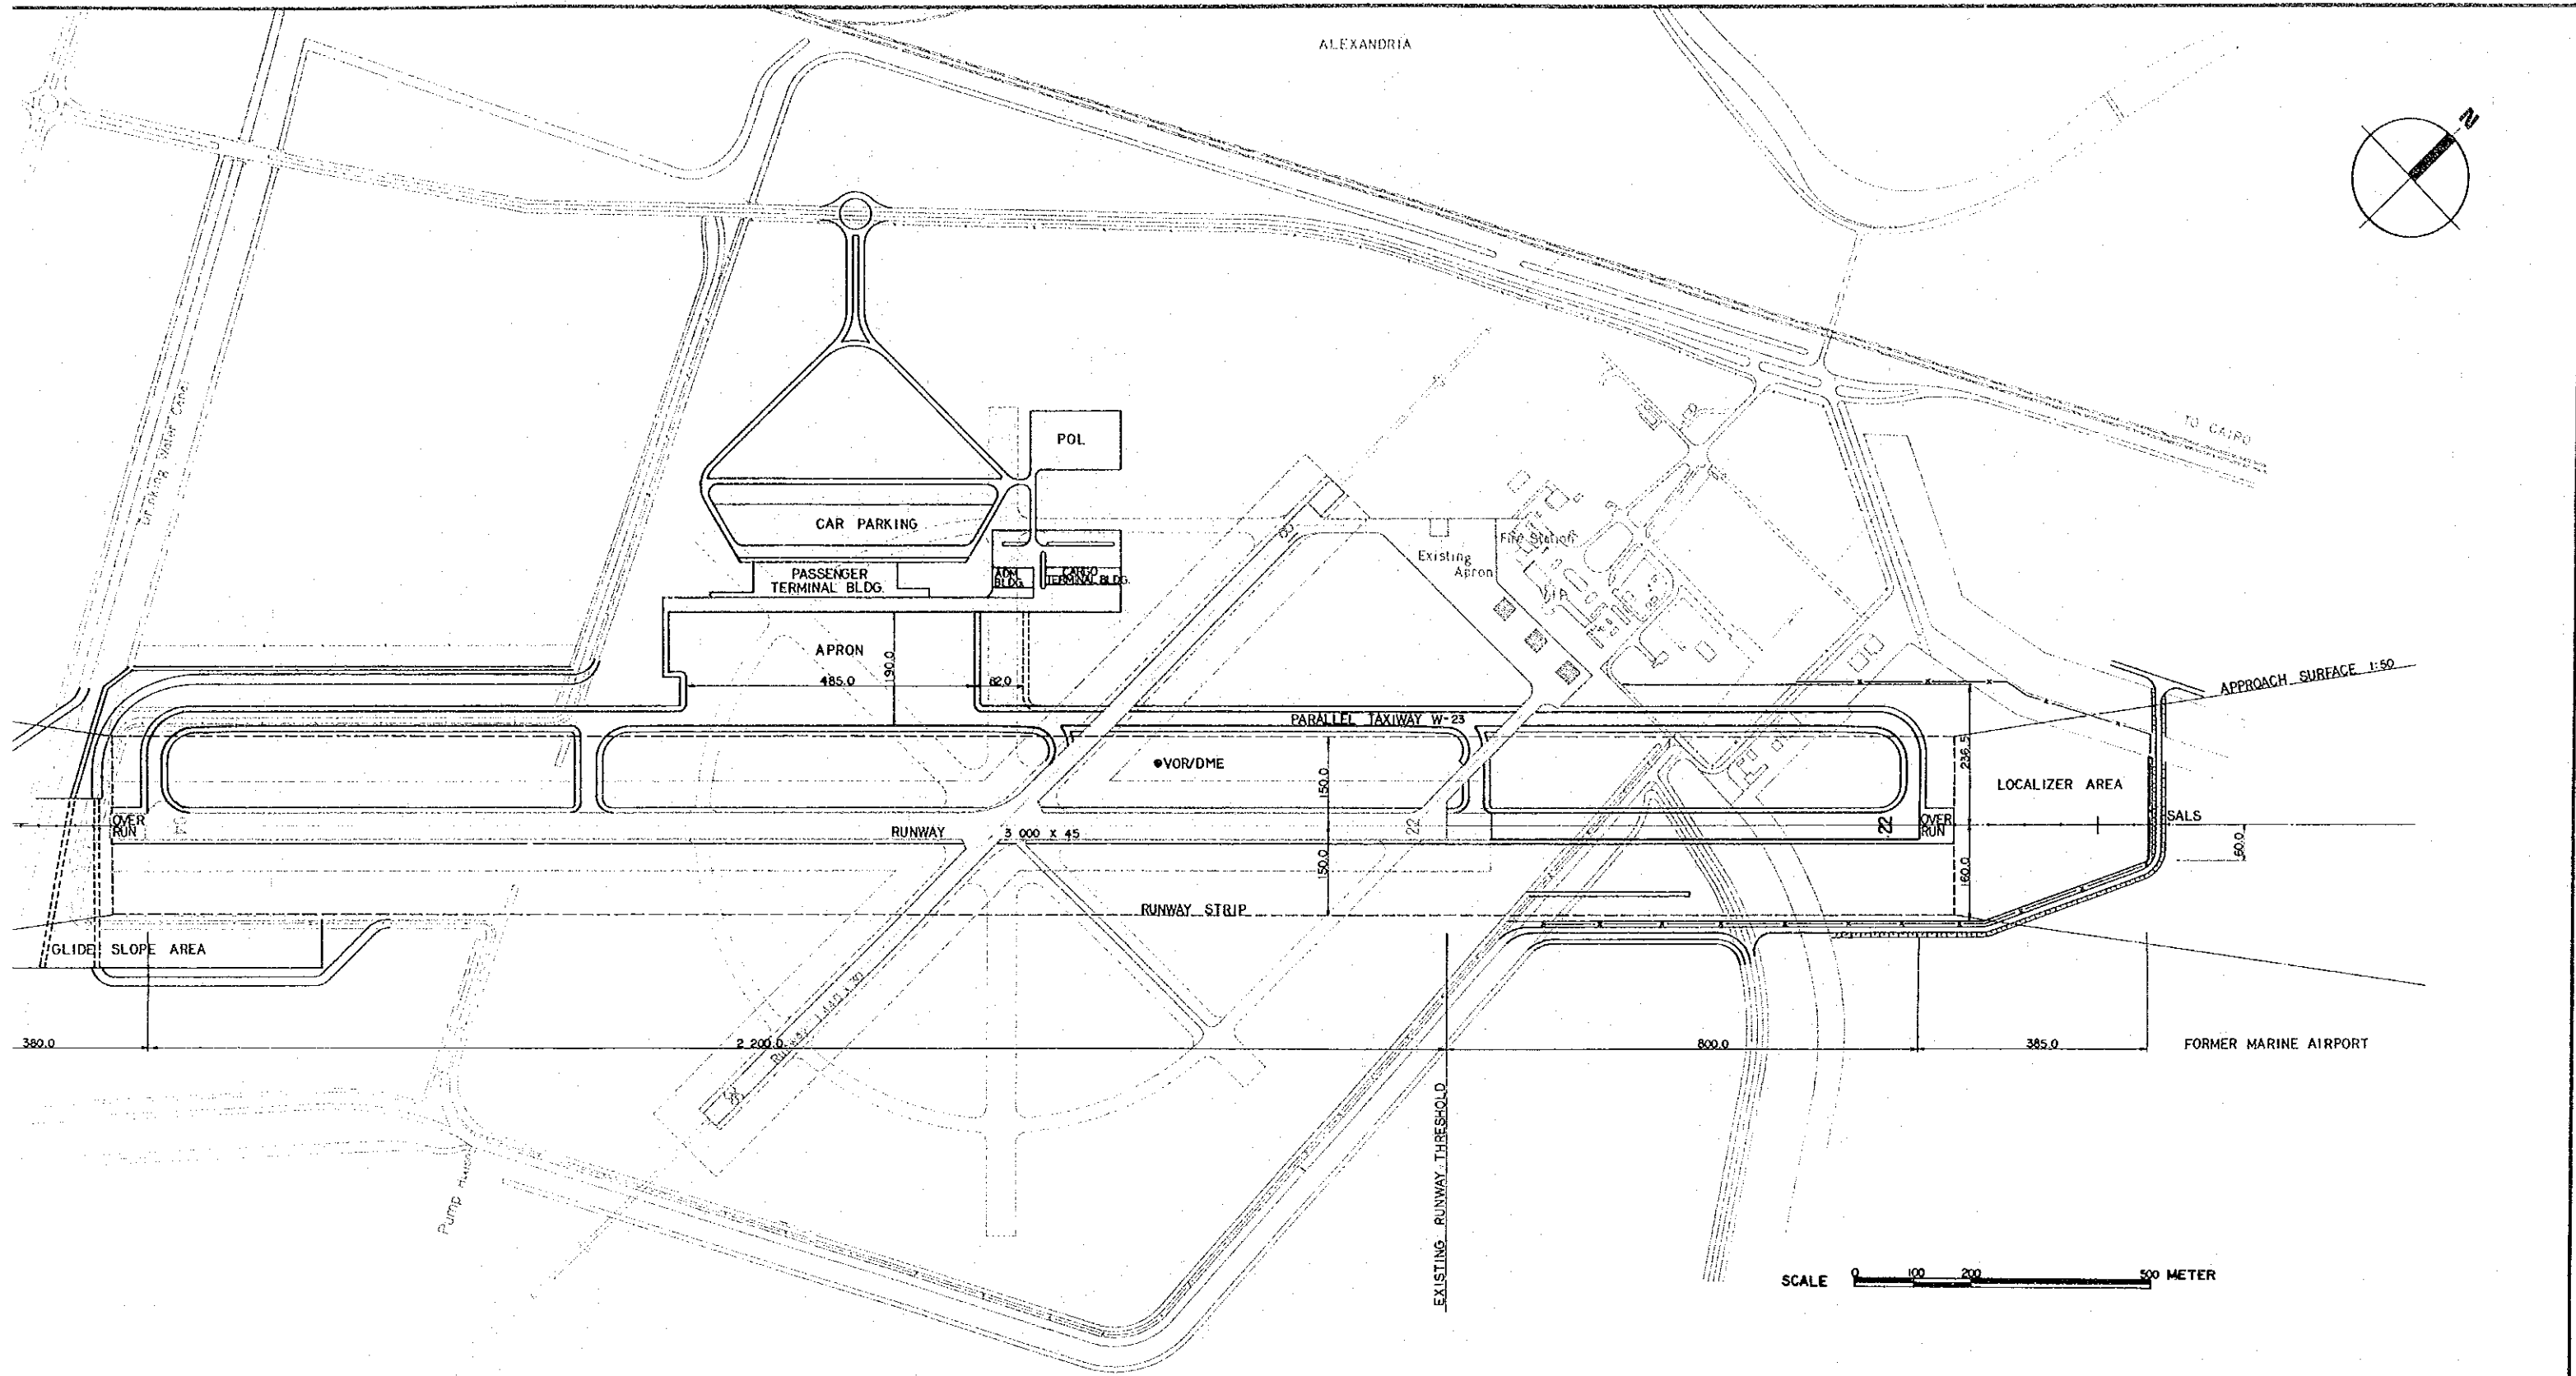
Layout Plan of Nozha Airport Development (Alt-A)
